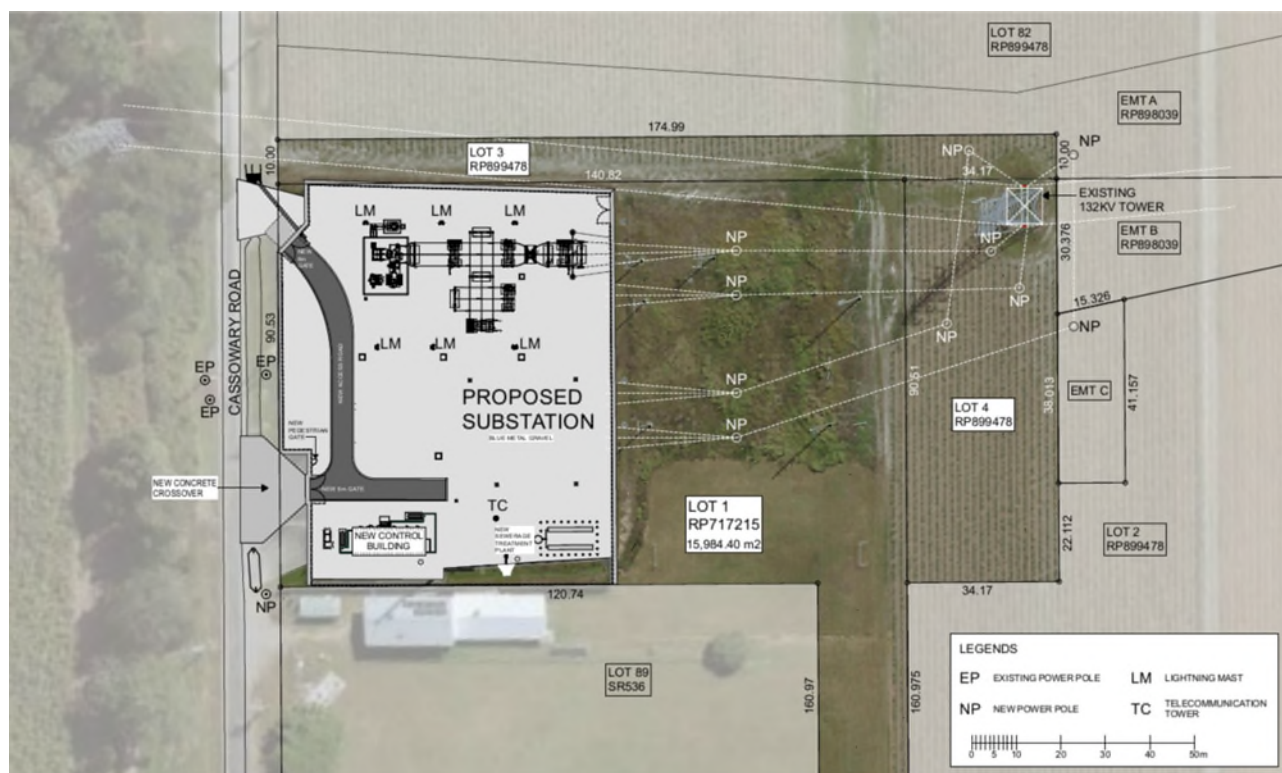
Proposed Substation Upgrade Plans (Source: Energy Queensland Architect)
